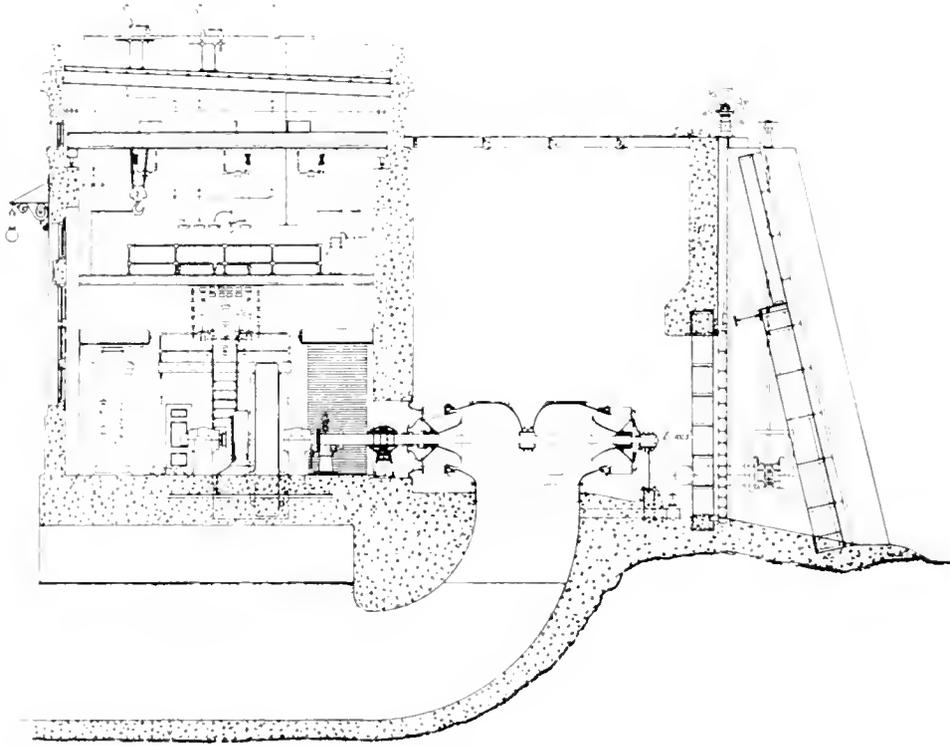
Sectional view of power house and flume showing compact arrangement of the equipment
